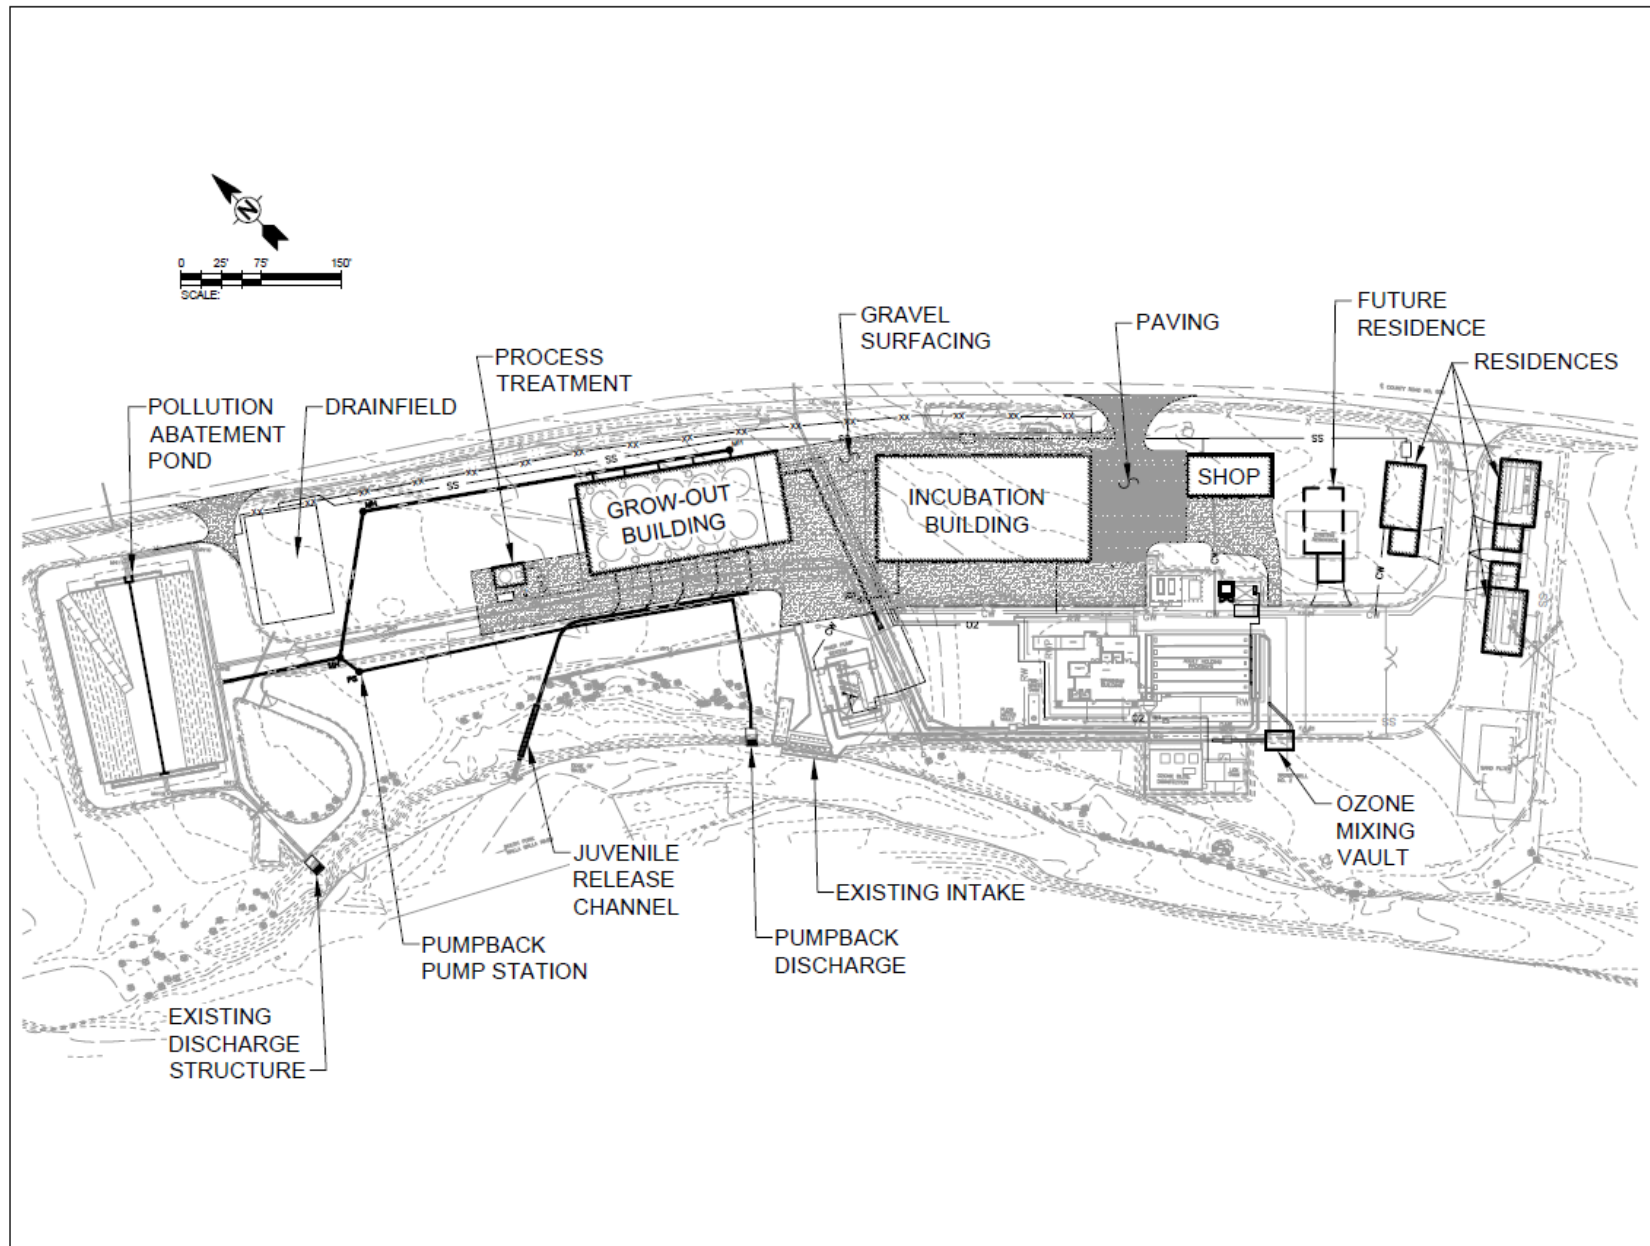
Proposed New Facilities at South Fork Walla Walla Hatchery Site: Alternative 1
